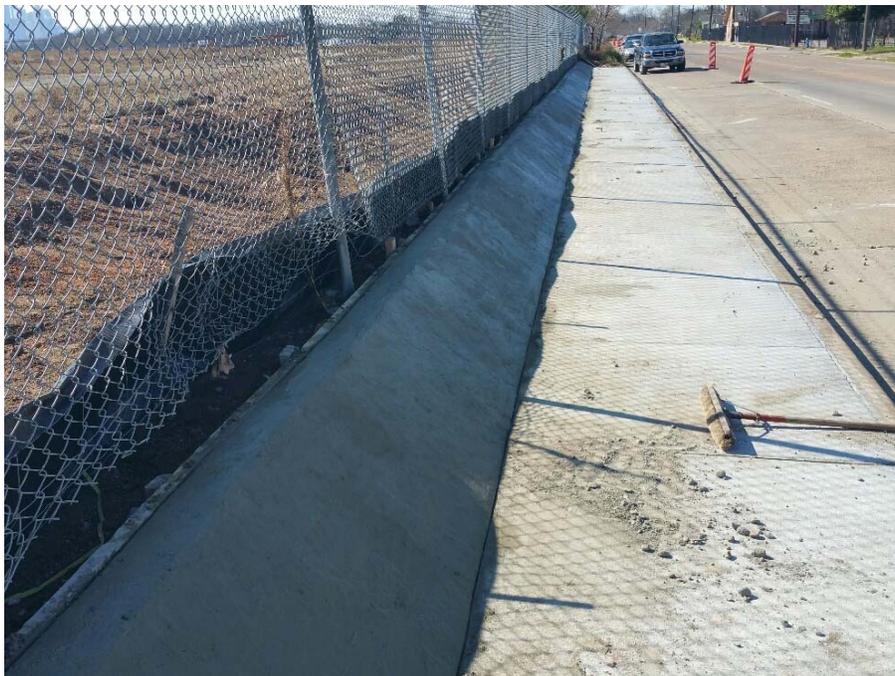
Concrete sidewalk cap area, sand bedding and reinforcing steel for concrete sidewalk (1-19-2016).
